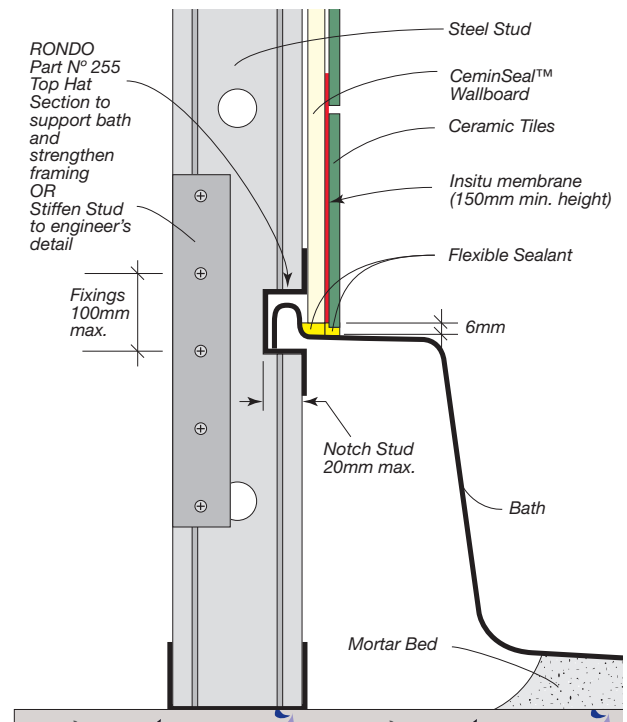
Bath Installation – Steel Stud Wall – Elevation
